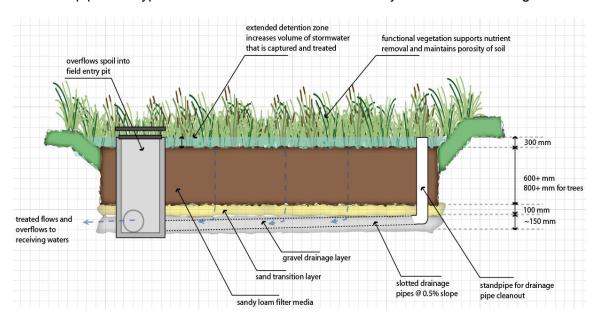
Bioretention system typical arrangement (Water by Design 2009)
